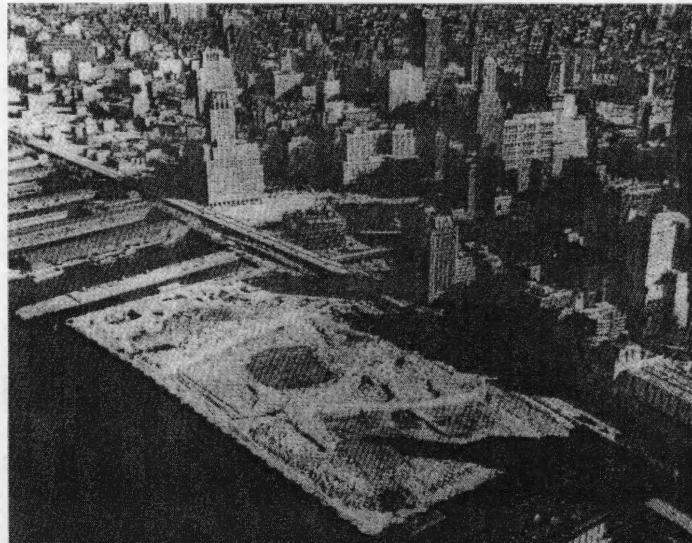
The World Trade Center under construction with landfill in the Hudson River
